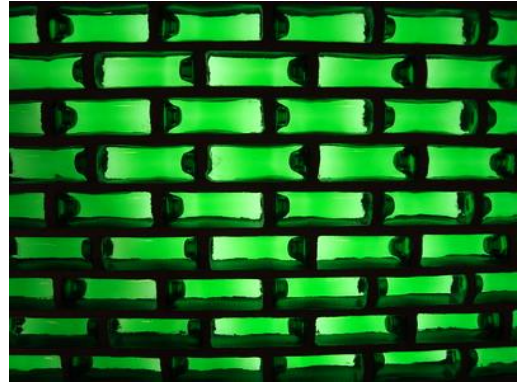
Heineken Wobo Wall (Stark, 2009)
